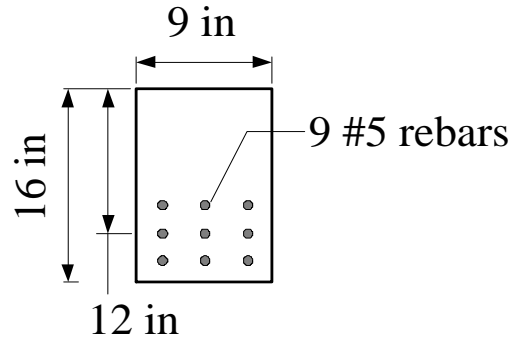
Section dimension and arrangement of longitudinal reinforcement steel rebar for section RC/St60 16R-1
